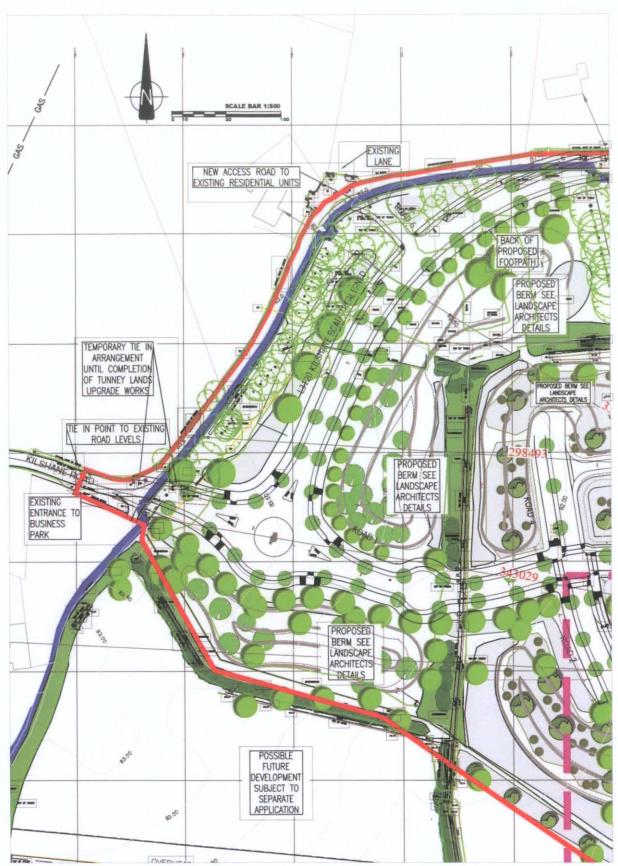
Proposed site plan part 1 (See drawing set for full resolution version)
